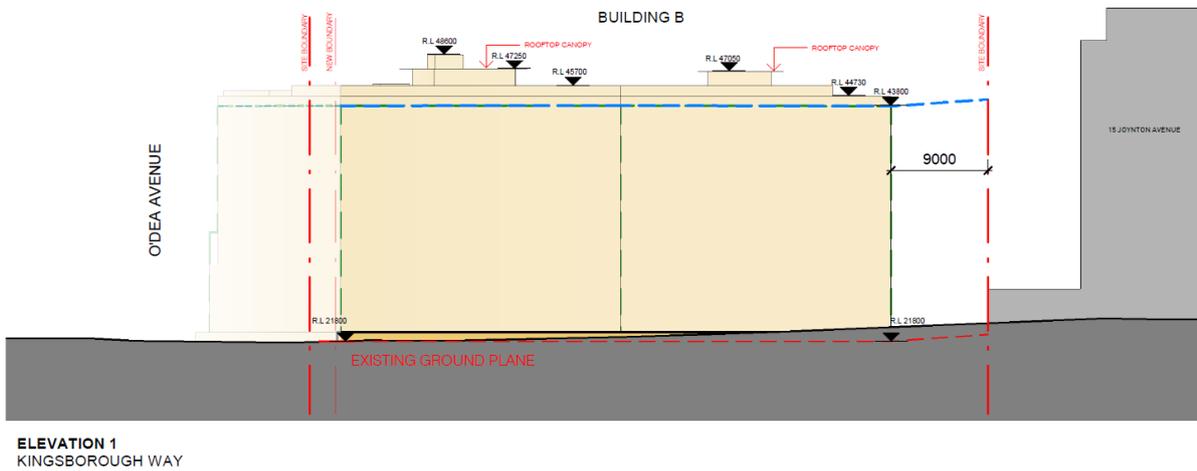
Proposed elevation – Kingsborough Way. Approved concept building envelope outlined in green and approved 22m height outlined in blue.
